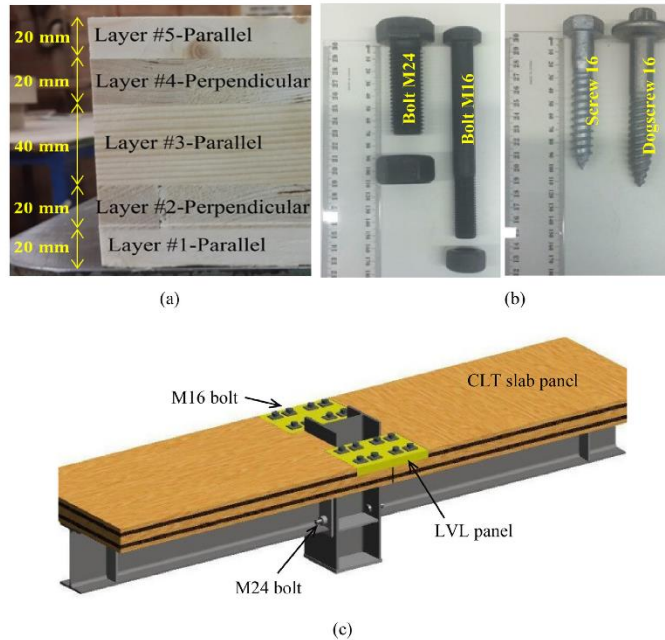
4 (a) Layout and thickness of lamellae in CLT panels, (b) high strength bolts, coach screws and dogscrews and (c) schematic outline of specimens (Keipour, 2018).
